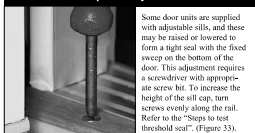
Raise or lower the sill for adjusting the sill screws. Some sill may have covers over the adjusting screws. These covers must be removed prior to making any adjustments.
